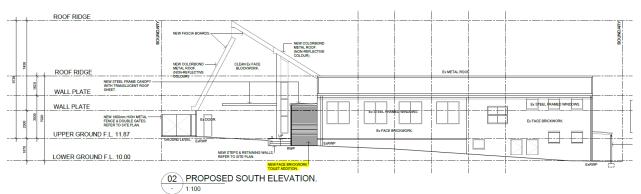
Proposed toilet block addition as seen on the elevation plans
